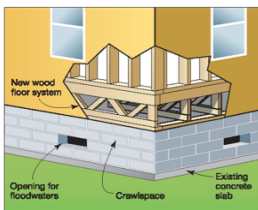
Mitigating a slab-on-grade house by elevating an existing wood-framed house without the slab and installing a new wood truss floor system (adapted from FEMA P-259 Figure 5E-19)
